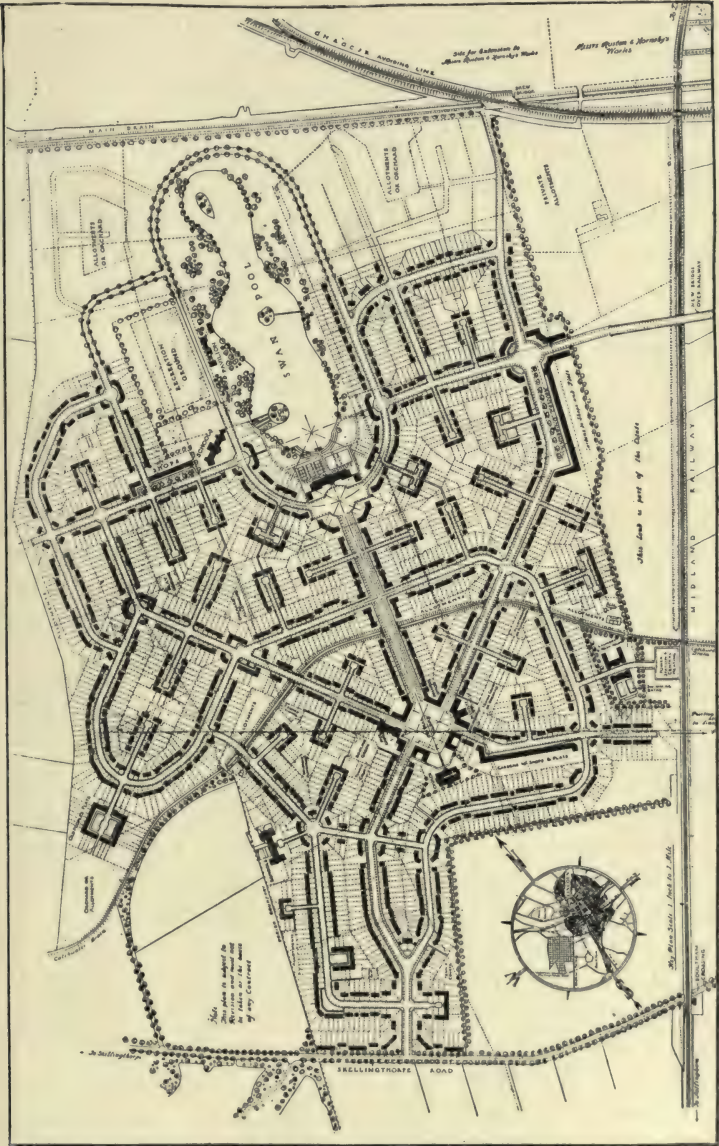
Lay-out plan of Swanpool Garden Village near Lincoln.
